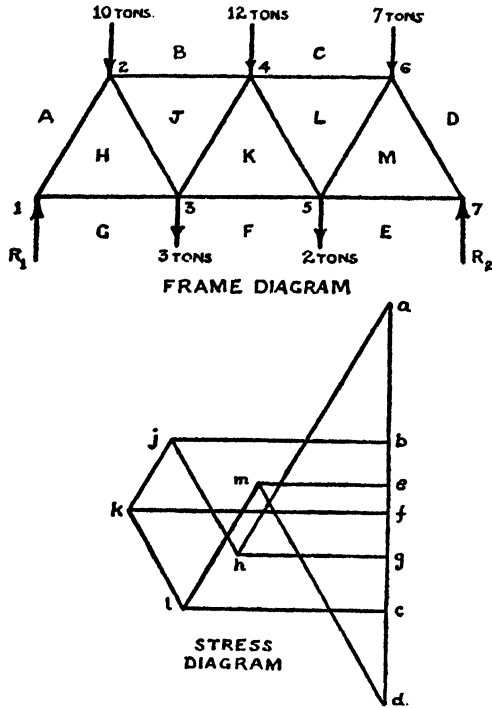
STRESS DIAGRAM FOR A ROOF TRUSS
